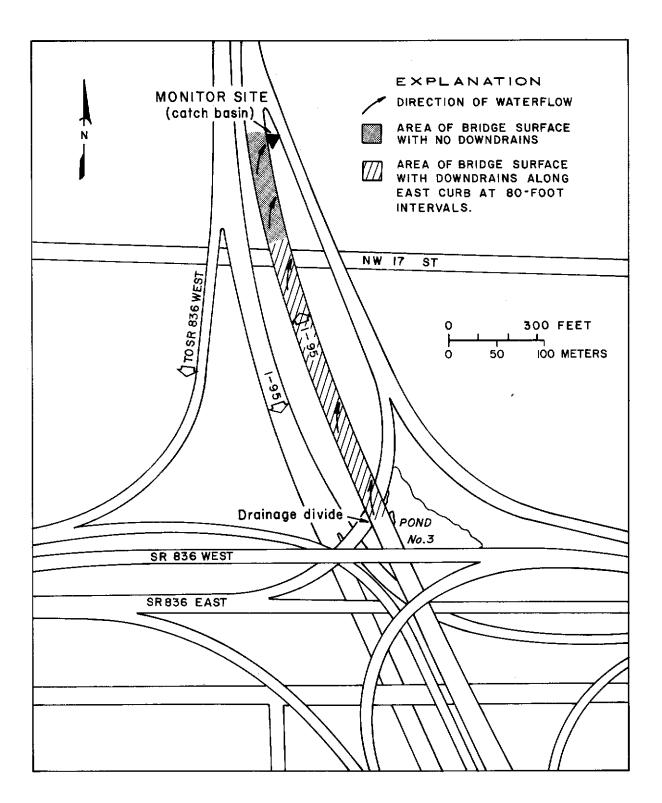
Study site on Interstate 95 bridge north of State Road 836 in Miami, Florida.
